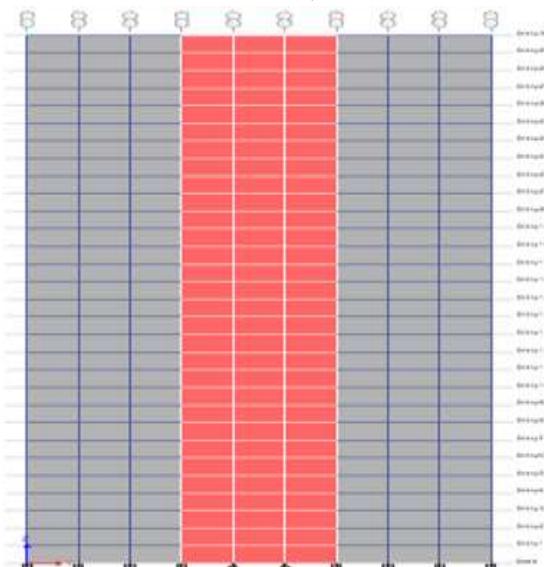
Elevation of 30 storey model HB showing infill (Shear wall) in three central bays at outer periphery.
